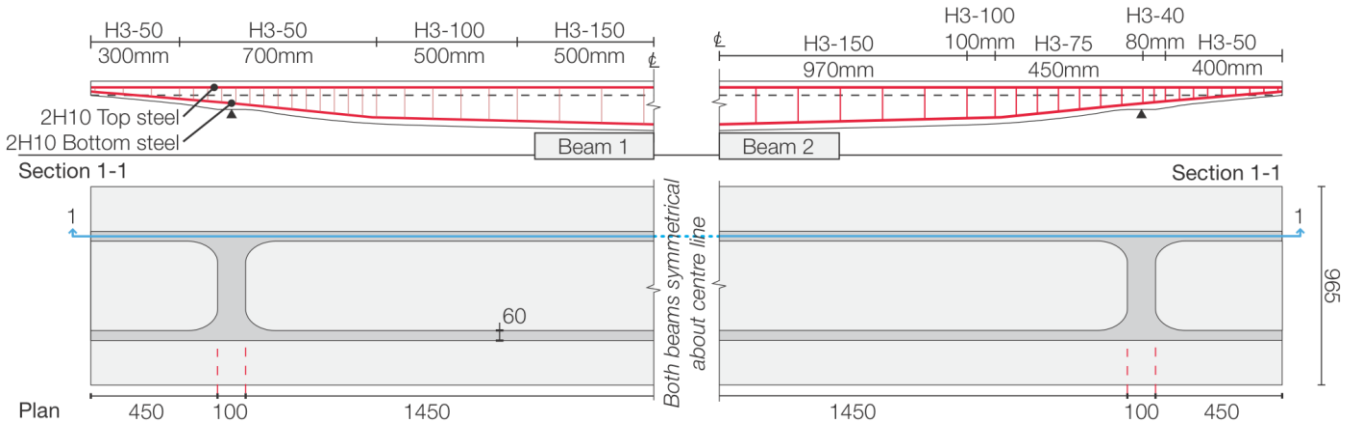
Beam 1 and Beam 2 Designs and reinforcement layouts
